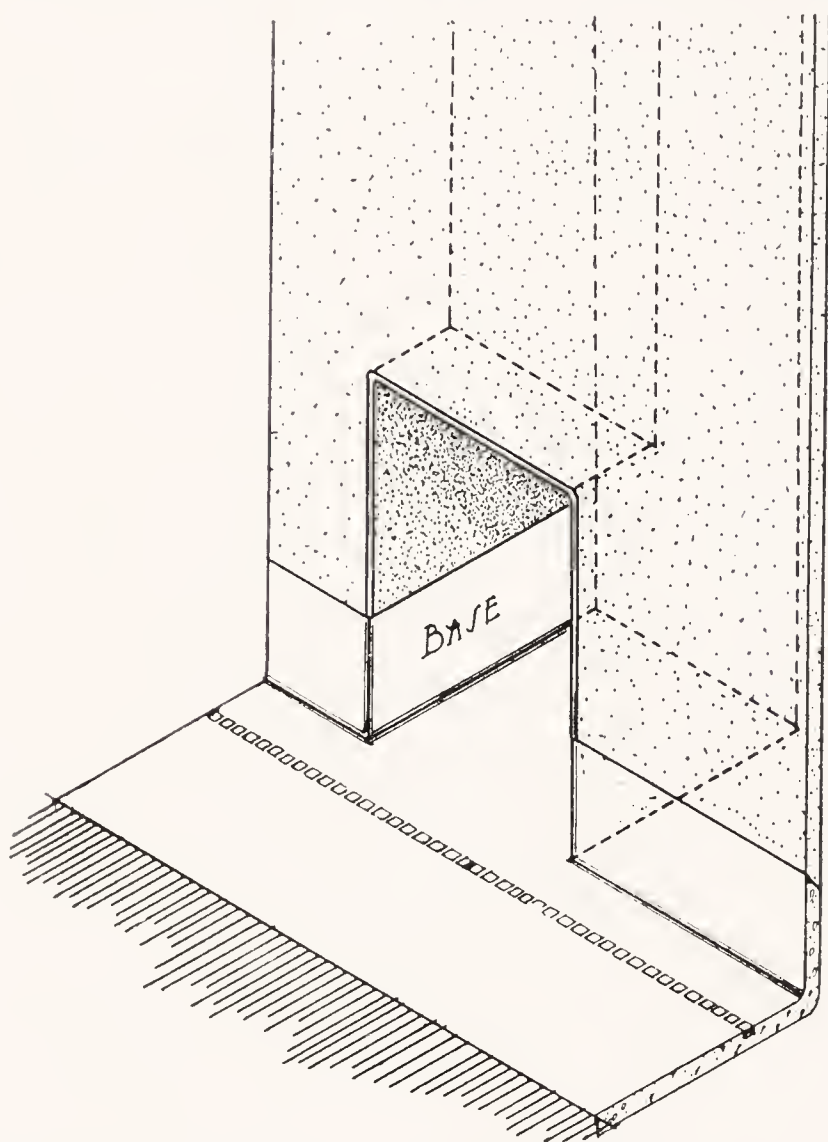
DETAIL OF VENT FLUE AT FLOOR
